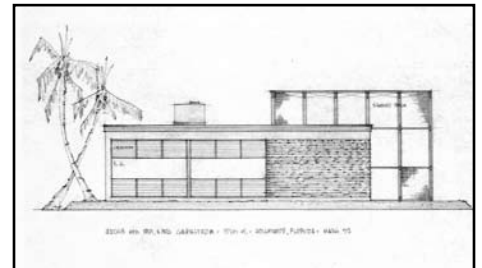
Front elevation rendering of Reed’s Gahstrom House (built 1952) that shows influence of Plevitzky’s Birdcage House. [Charles Reed, Jr. collection]
